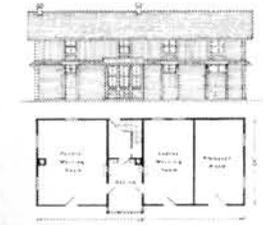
Track and main floor plan of 1883 CPR Medicine Hat station.
